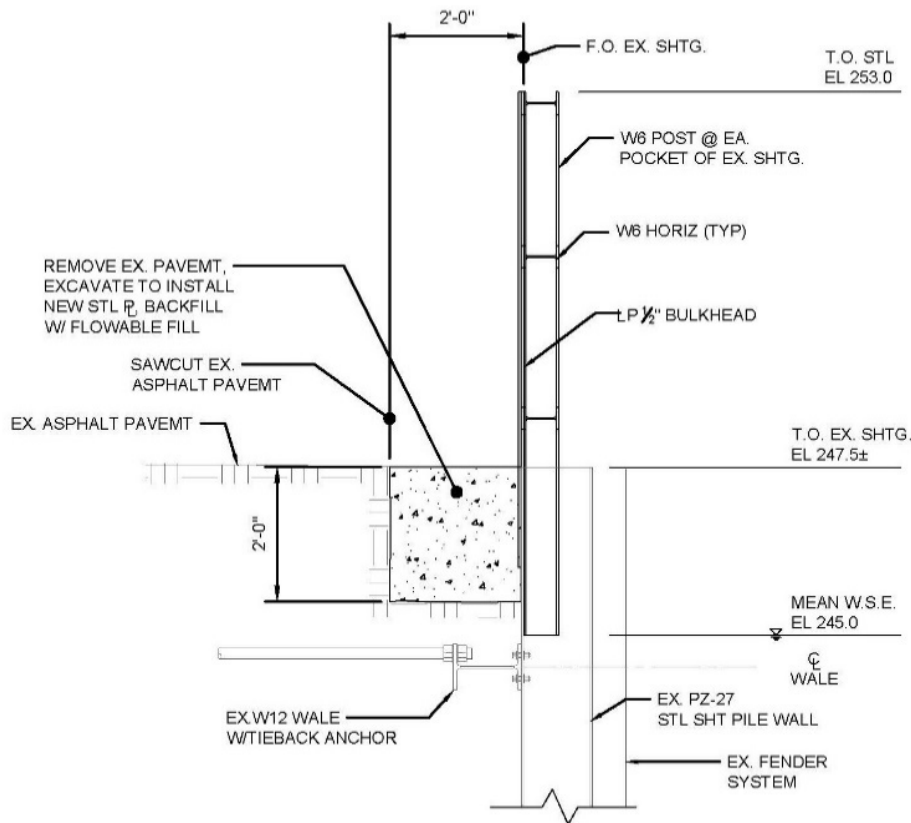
US Coast Guard Station: Flood Wall Detail at Boat Slip End Wall
